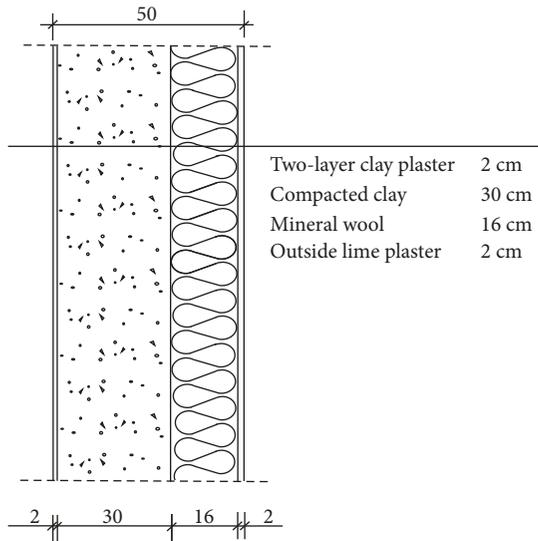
Cross section of the wall made of clay compacted in formwork.
